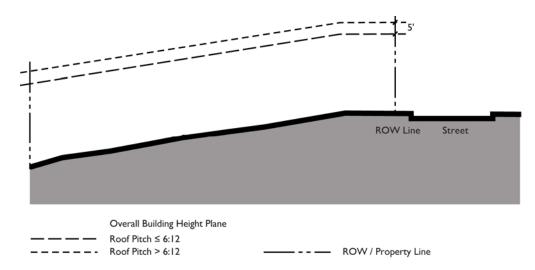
Figure A. Building height plane for an undeveloped site (not drawn to scale).
